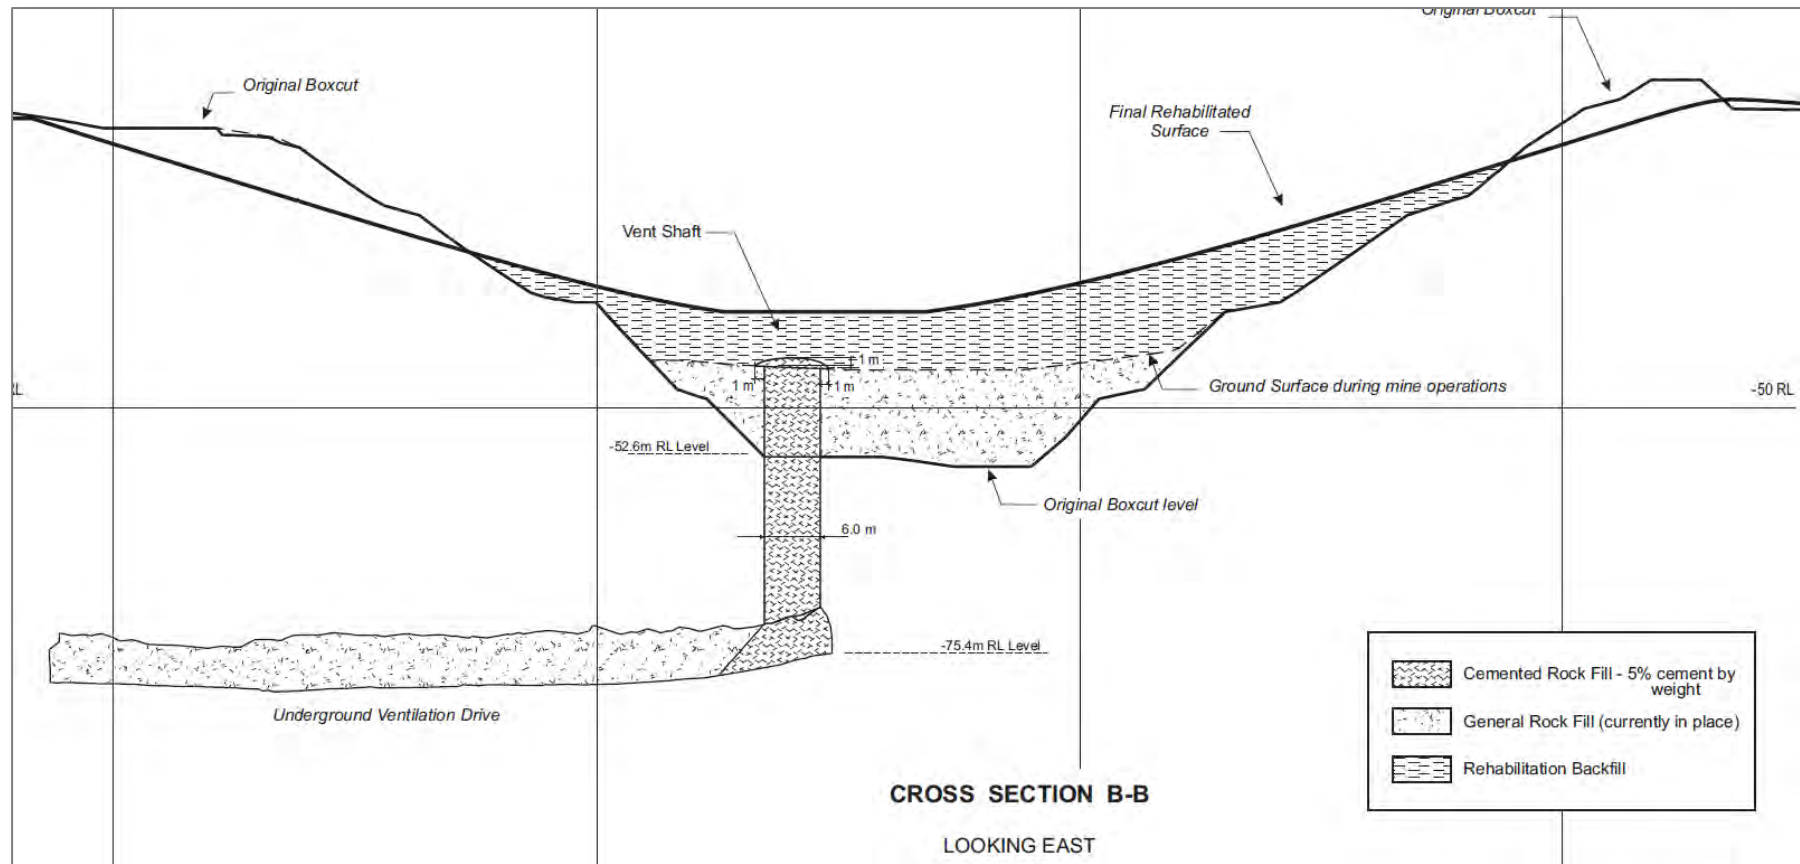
| A SIMILAR SYSTEM TO THAT APPROVED AS PART OF THE CLOSURE PLAN STRATEGY FOR THE ANGAS ZINC MINE FOR BACKFILLING OF THE VENTILATION RAISE WILL BE USED AT BIH FOR THE RAISES AT THAT SITE. (ROACHE, 2014)
